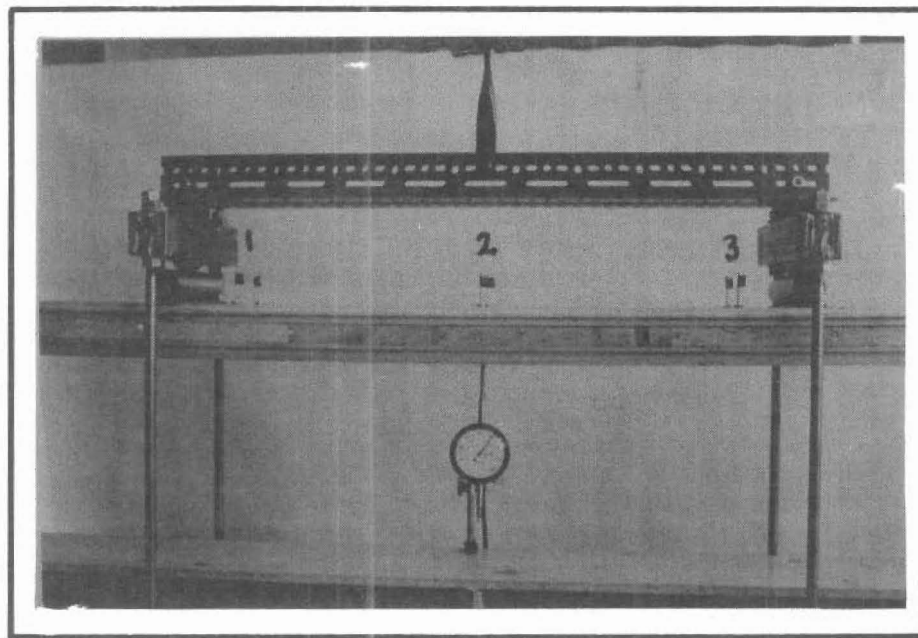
Targets and dial gauge used to measure deflections of prototype elements in bending.
